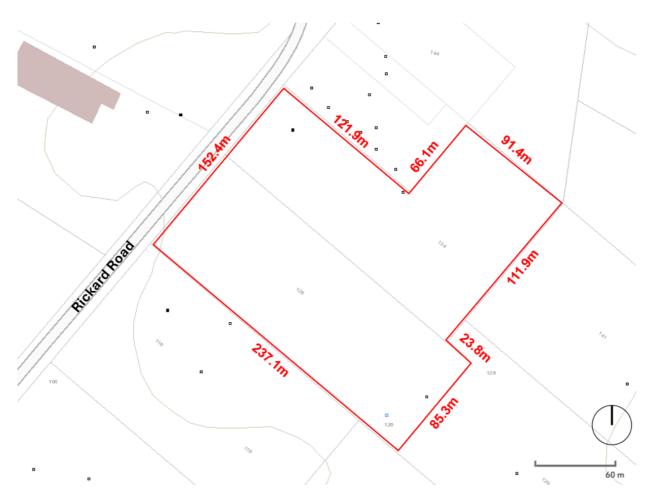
Site boundaries (Source: Gyde Consulting, adapted from Survey Plan at Appendix 2 and NSW Planning Portal Spatial Viewer)
